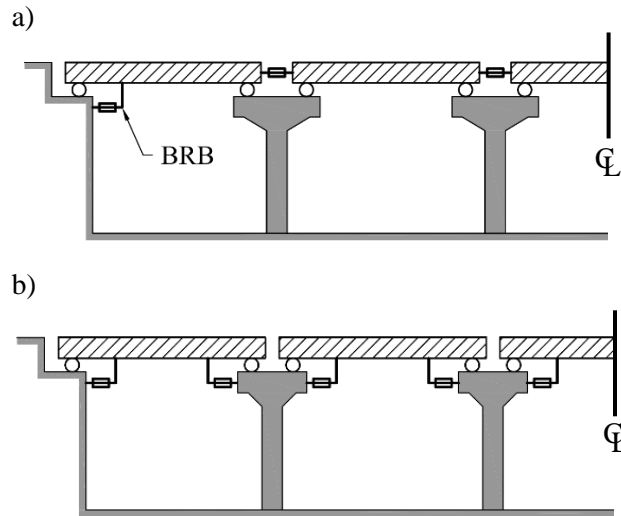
Configurations: a) BRBs connecting adjacent spans each other, and; b) BRBs connecting spans to piers and abutment
